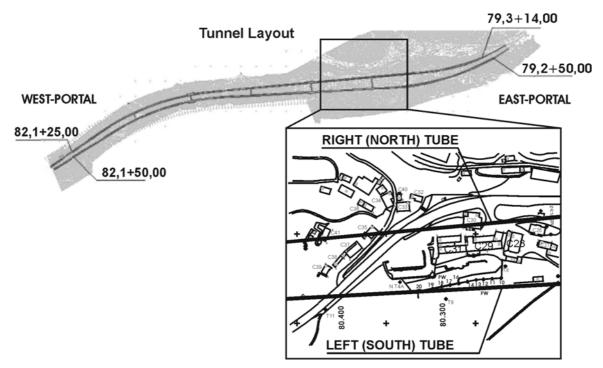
Layout of the Trojane Tunnel highlighting the discussed section in Trojane village
